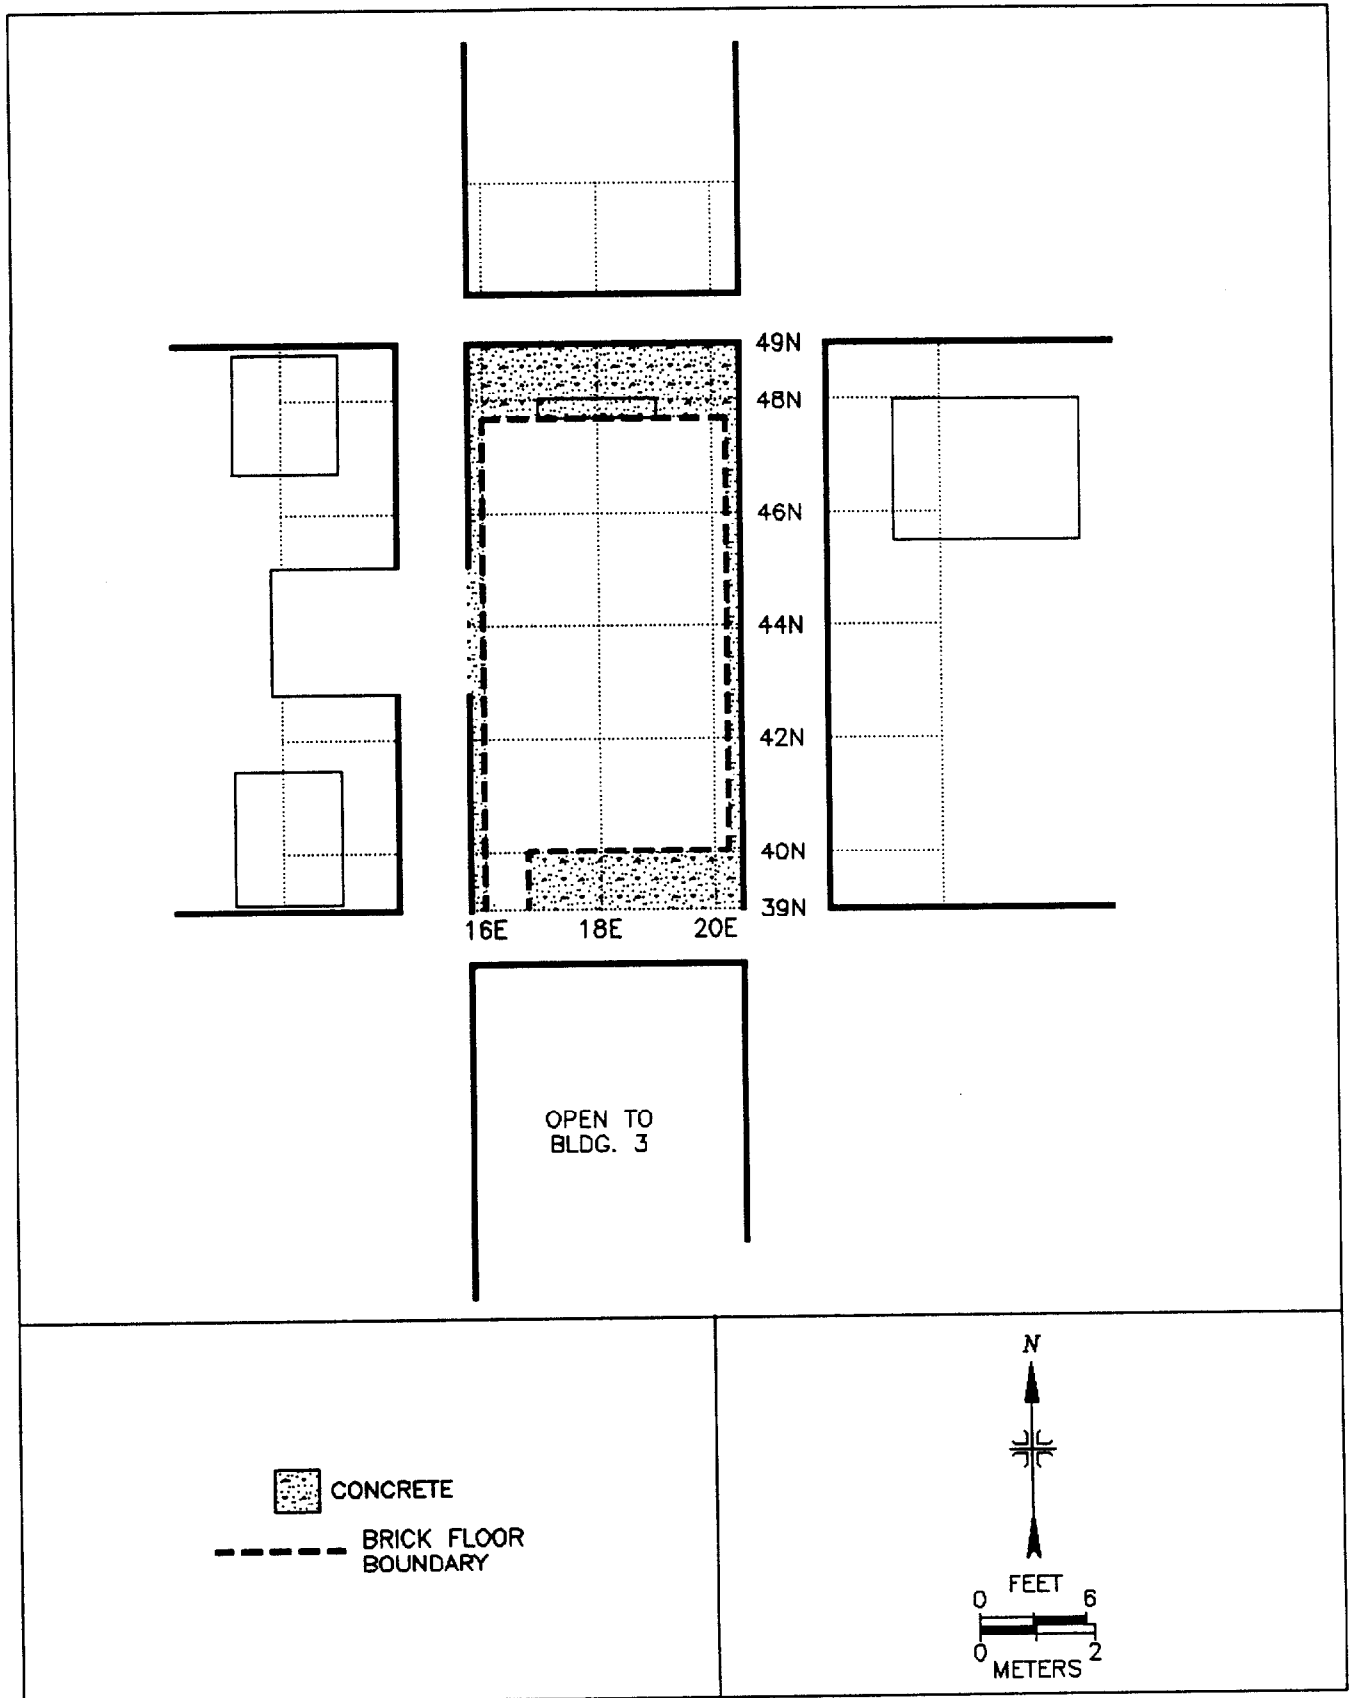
Floor Plan of Building 8, Room B - Reference Grid
